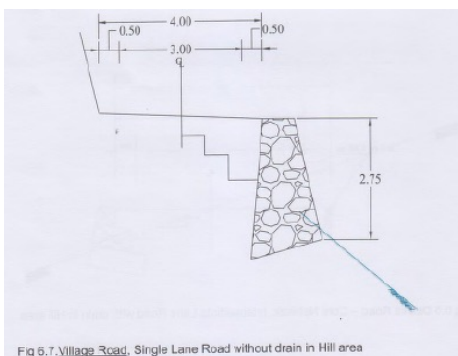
Village Road, Single Lane Road without drain in Hill area
